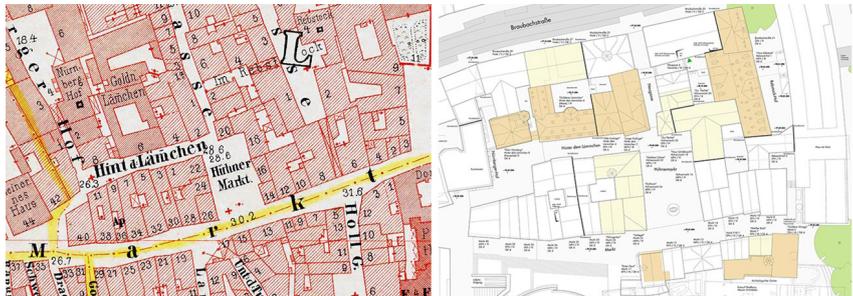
Frankfurt am Main, Ravenstein Plan, 1861 (extract); Dom Römer Areal, Plan.
